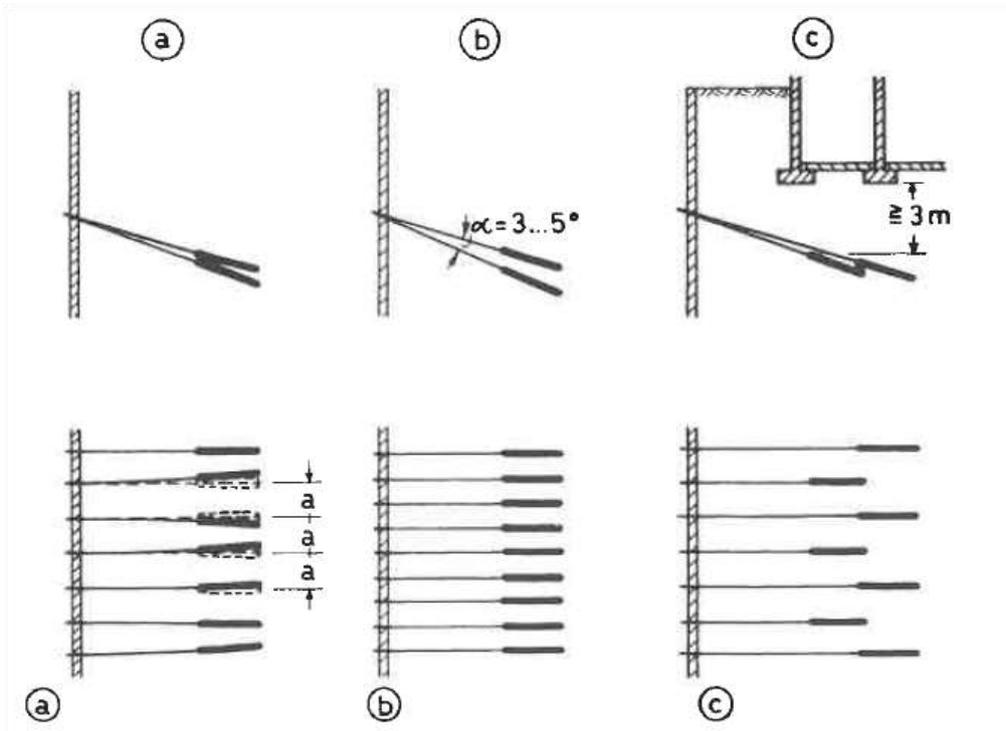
Examples of good and bad spreading and staggering of anchors: (upper) section, (lower) plan; (a) wrong; (b)-(c) right
